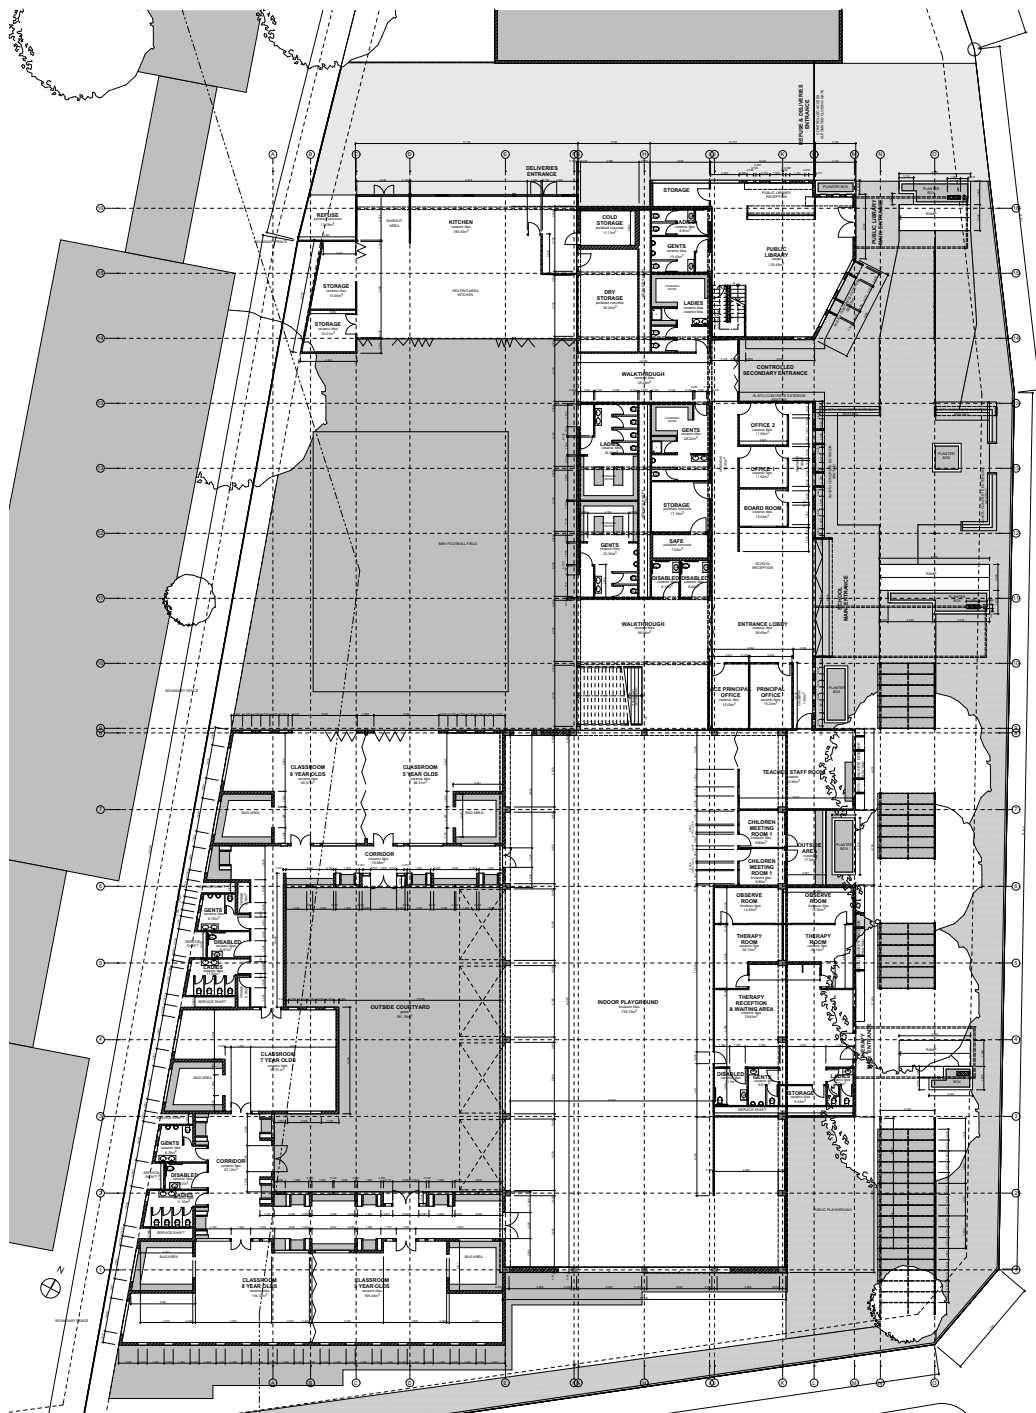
Phase 5 Ground Floor Plan (not to scale)
